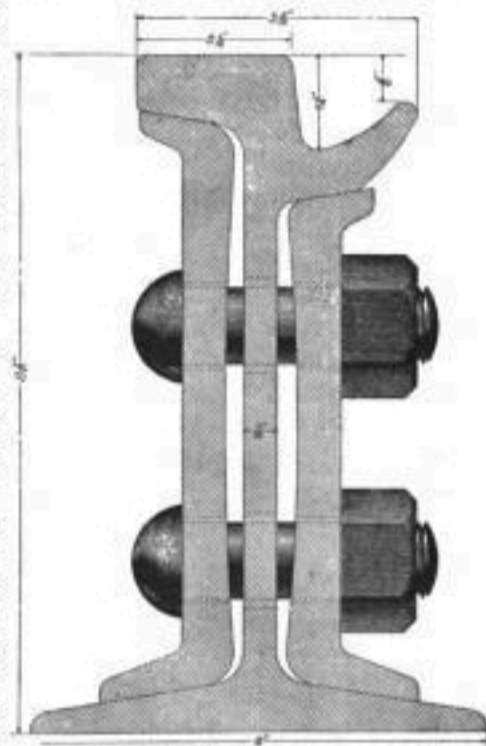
STANDARD 94 LB. HALF GROOVED RAIL—BINGHAMTON.
